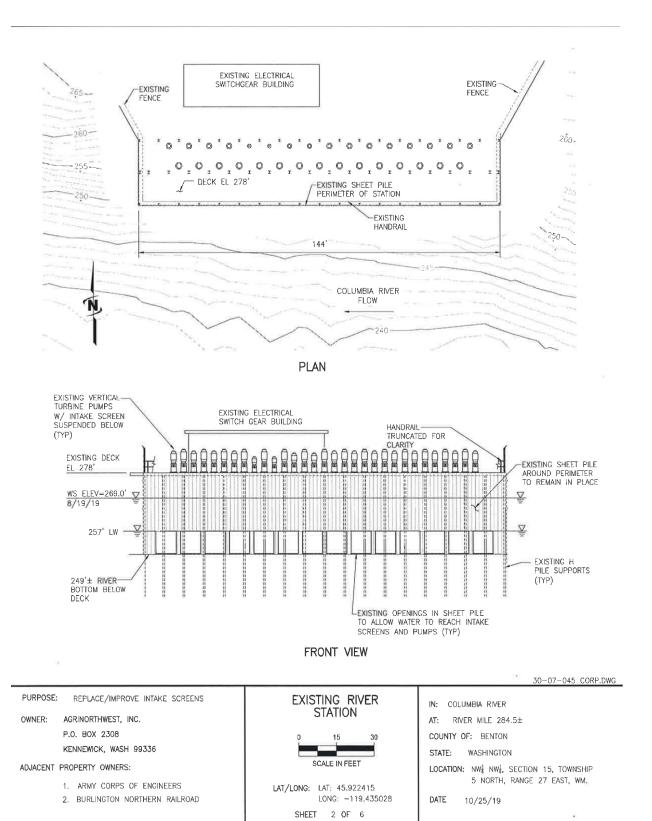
Existing AgriNorthwest pump station in the John Day Reservoir.
